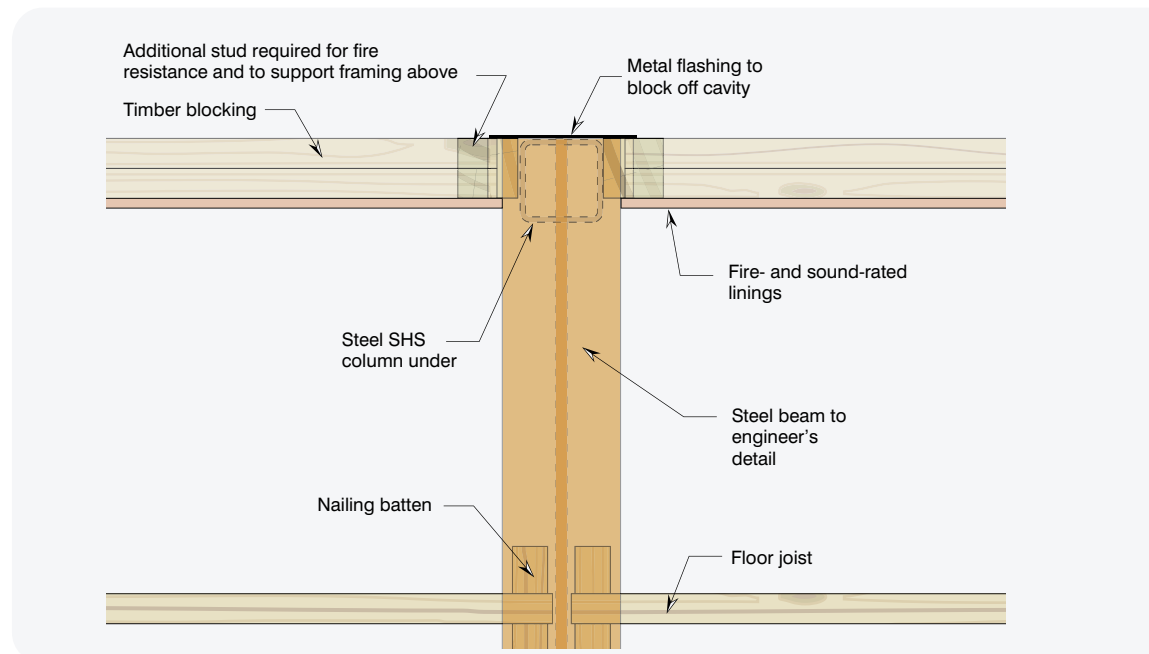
Details of the steel beam pocket in timber-framed separation wall – plan view showing one wall leaf only.
